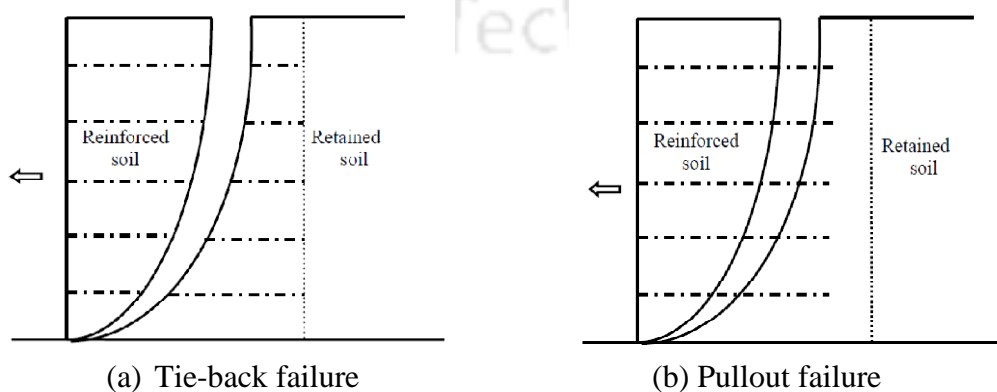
Potential internal failure mechanism of reinforced soil wall (FHWA 2001)
